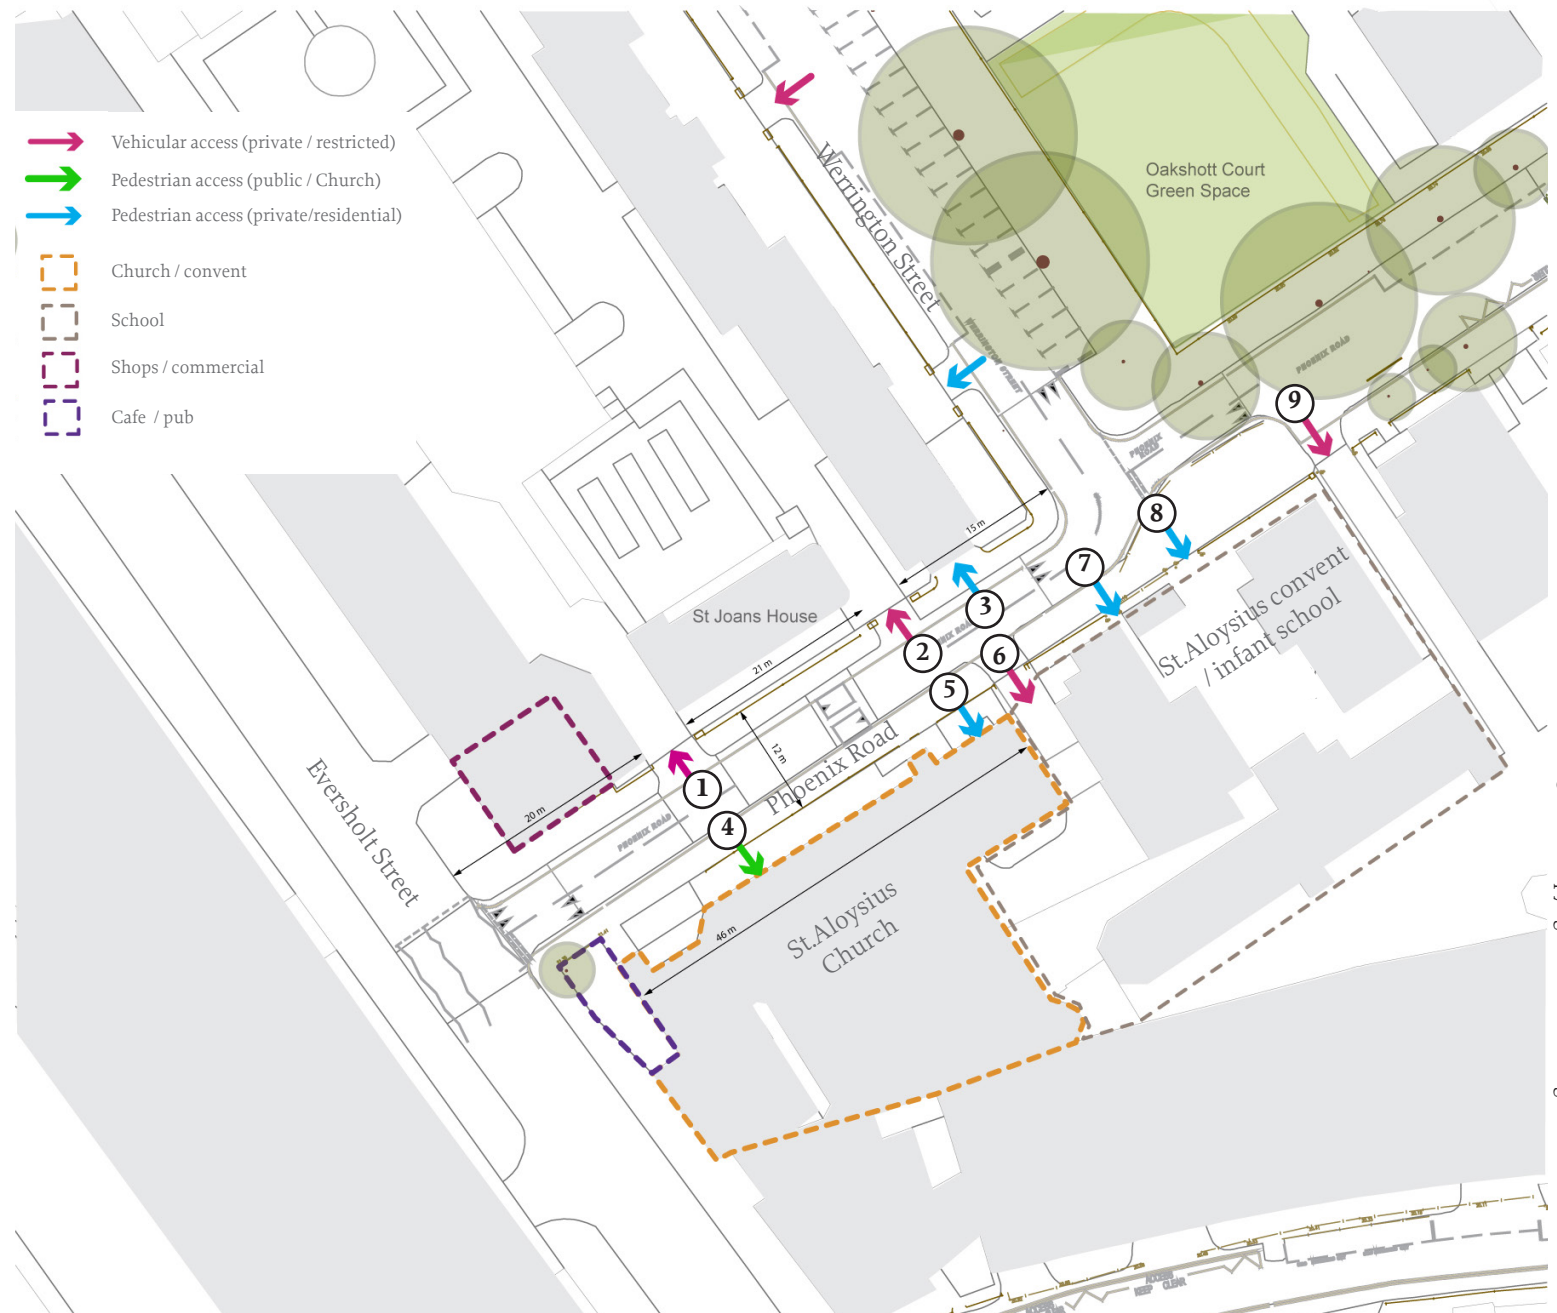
Access and circulation constraints on Phoenix Road, section between Eversholt Street and Werrington Street
